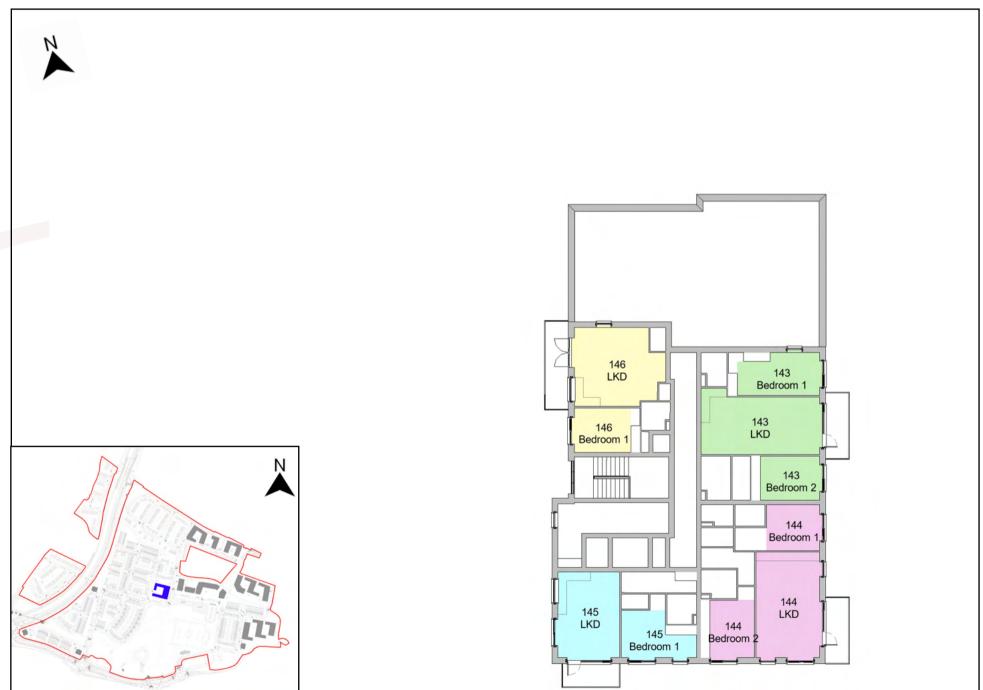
Floor plan of assessed building & Keyplan highlighting the assessed building.
